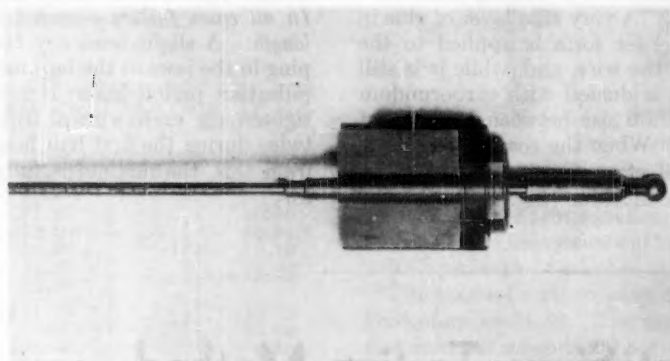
Test Piece Shown in Fig. 2 Placed in the Jaw of the Testing Machine.
